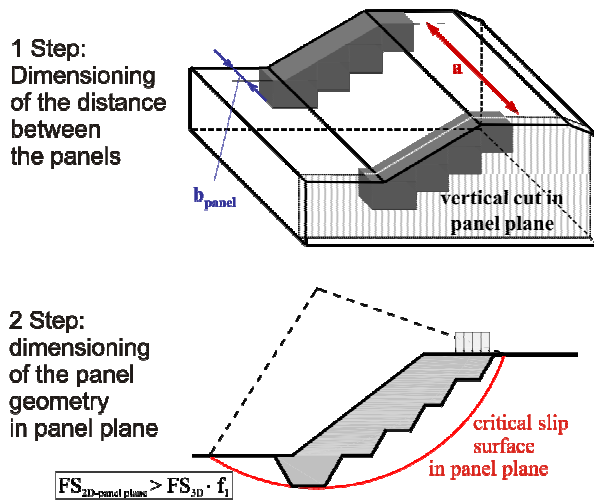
Case A1 – basic principle of the geometrical panel dimensioning
